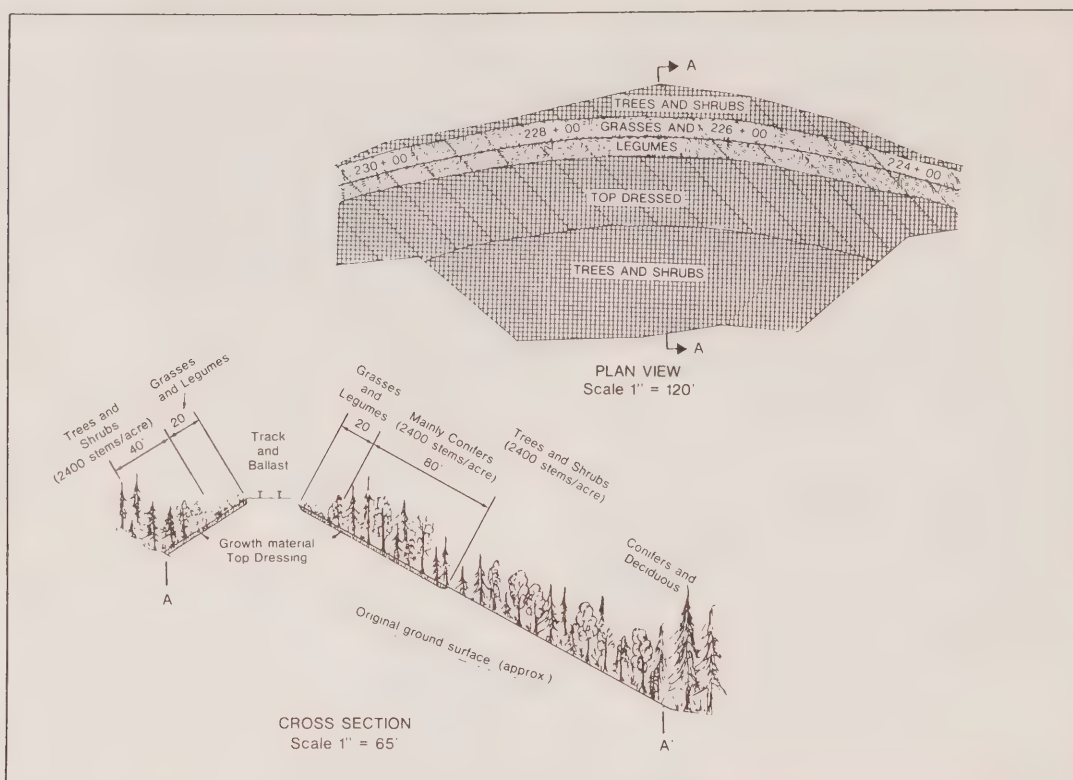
Reclamation Plan for Mountain Creek Pit Cut
